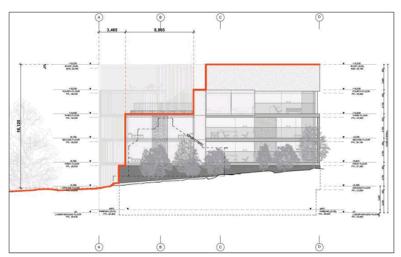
The highlighted height transition of the proposed development at its southern elevation where adjacent to the cottage at 6-8 Wilmot Street, shown dotted in (Source: Room 11 Architects).
